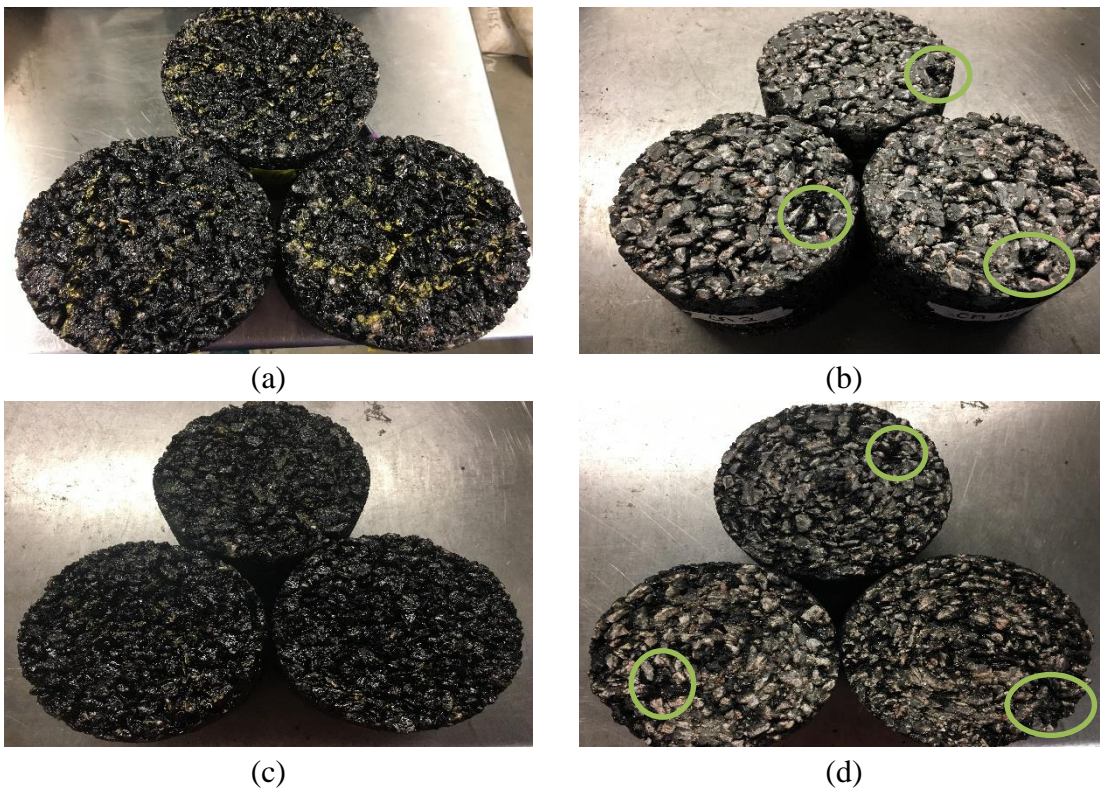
Singular Motion Surface Abrasion Test on the Top of the Specimen Using Cutter A (a) Un-Aged Before, (b) Un-Aged After, (c) Aged Before, and (d) Aged After
